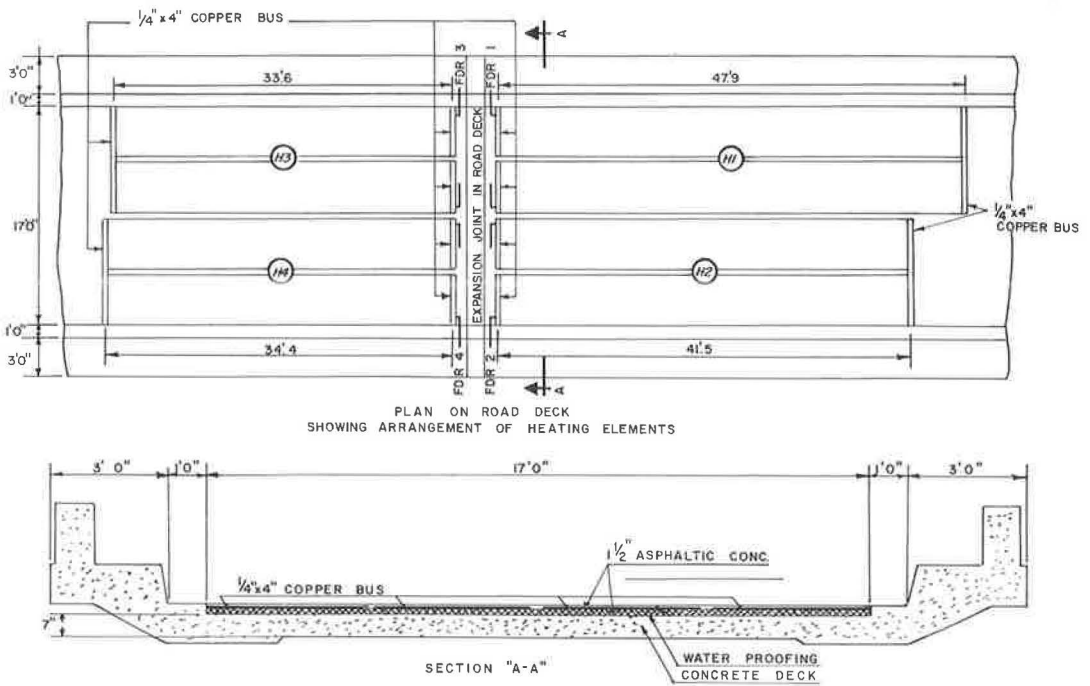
Plan and cross-section of first test installation showing arrangement of heating elements.
